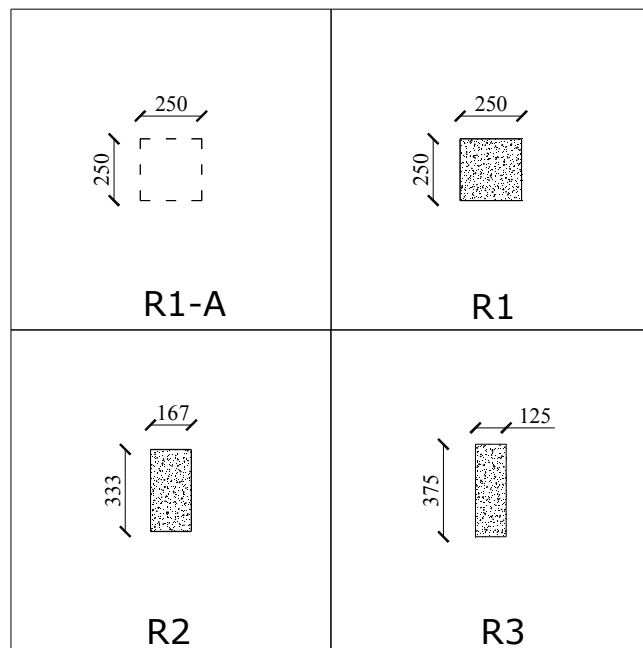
Unstrengthened test specimens (Reference specimens)
